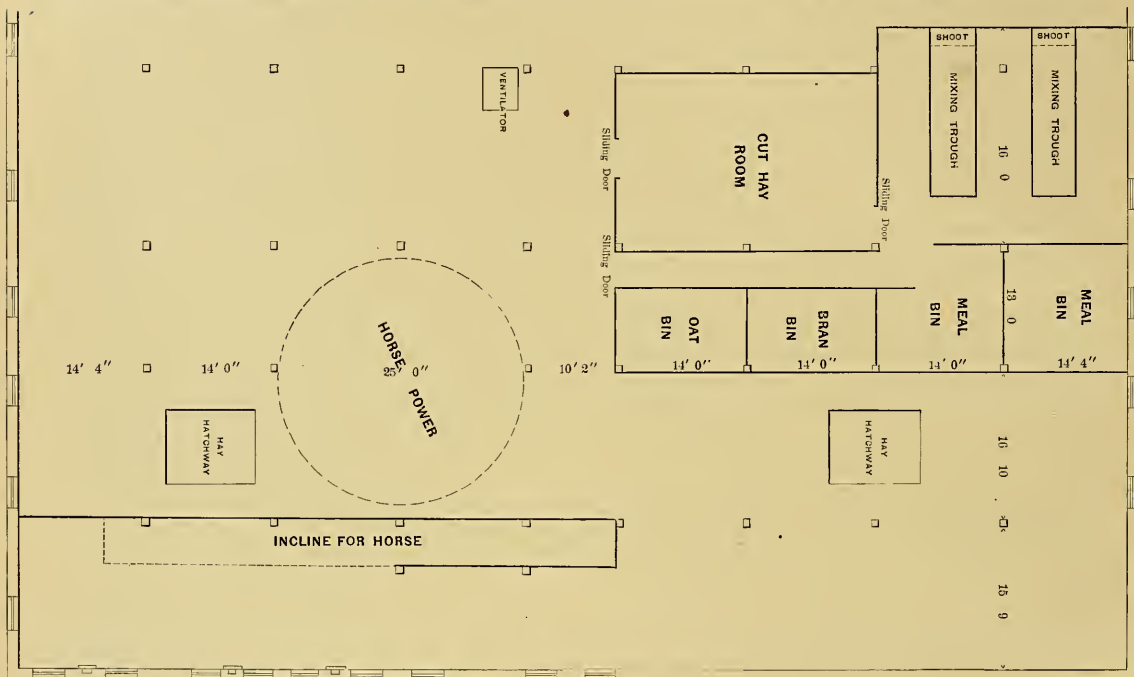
FLOOR OF FEED DEPARTMENT.
